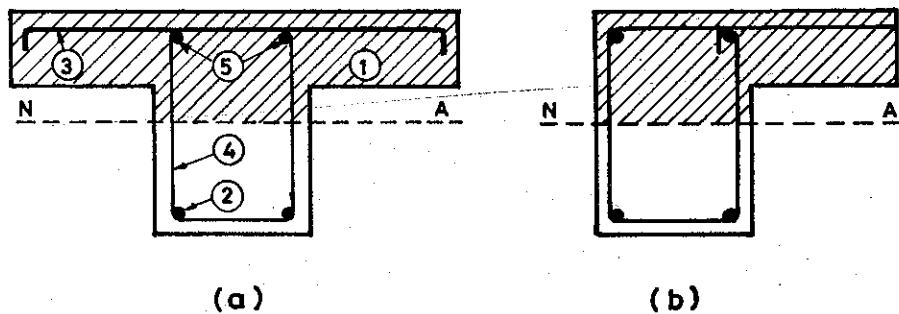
Flanged beams: (a) T beam—1—Compression in concrete; 2—Tension steel; 3—Transverse steel; 4—Stirrups for shear; 5—Anchorage of stirrups; (b) L beam.
